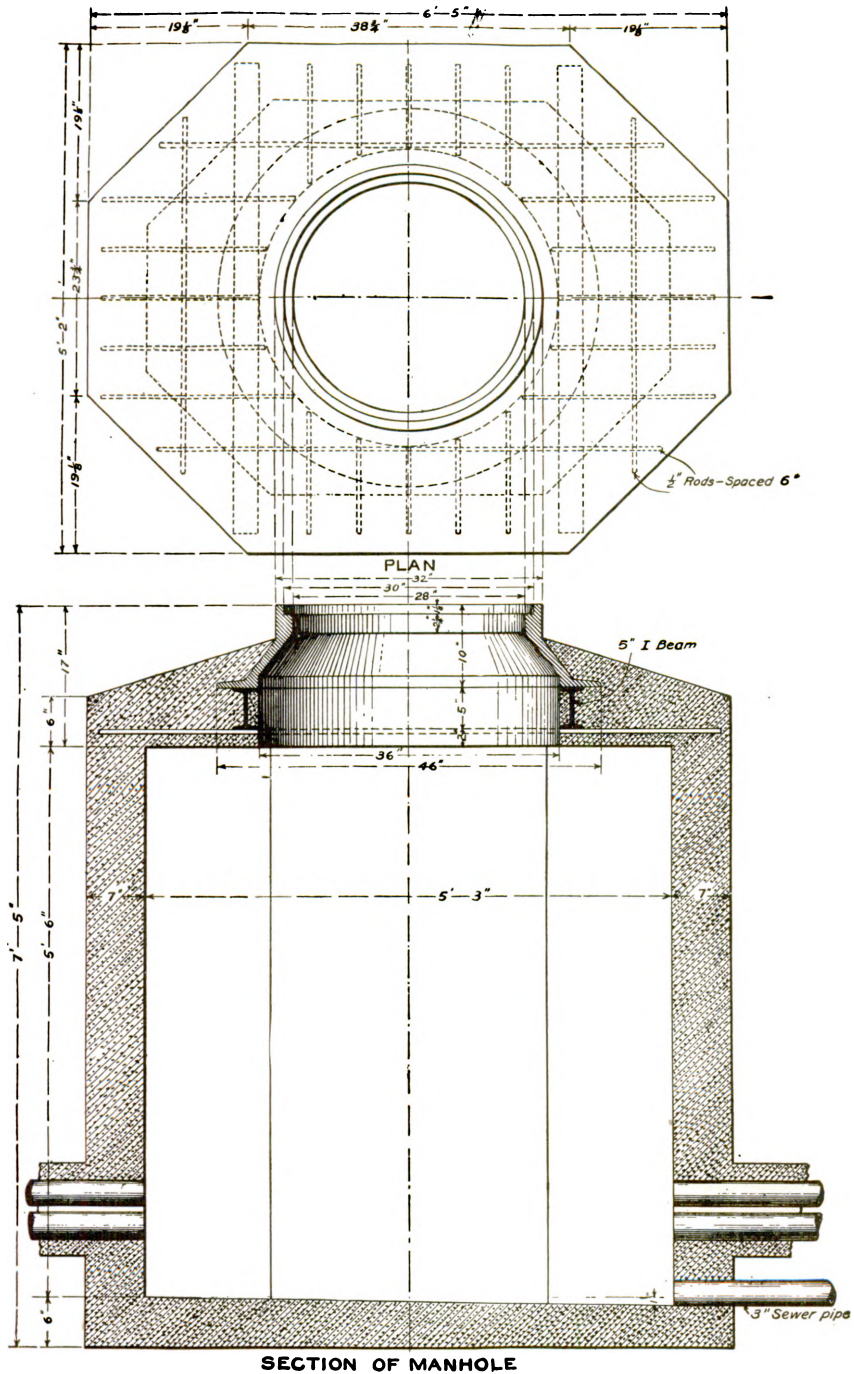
CABLE SYSTEM, MANHOLE WITH CONCRETE TOP.
